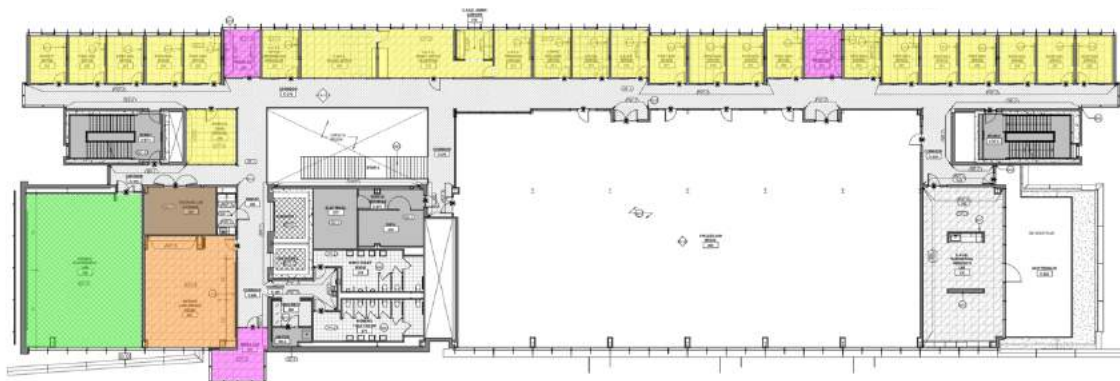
Rooms affected by AHU3 - Second floor (Source: Architectural plans)
